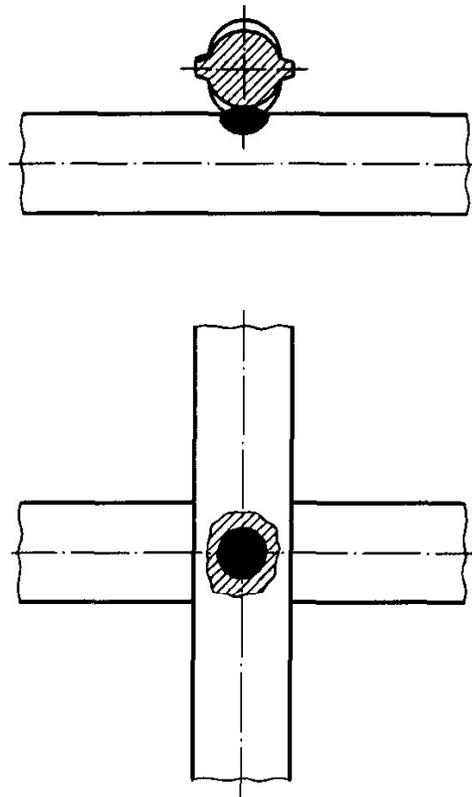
Cross joint for loadbearing joints welded by process 23
